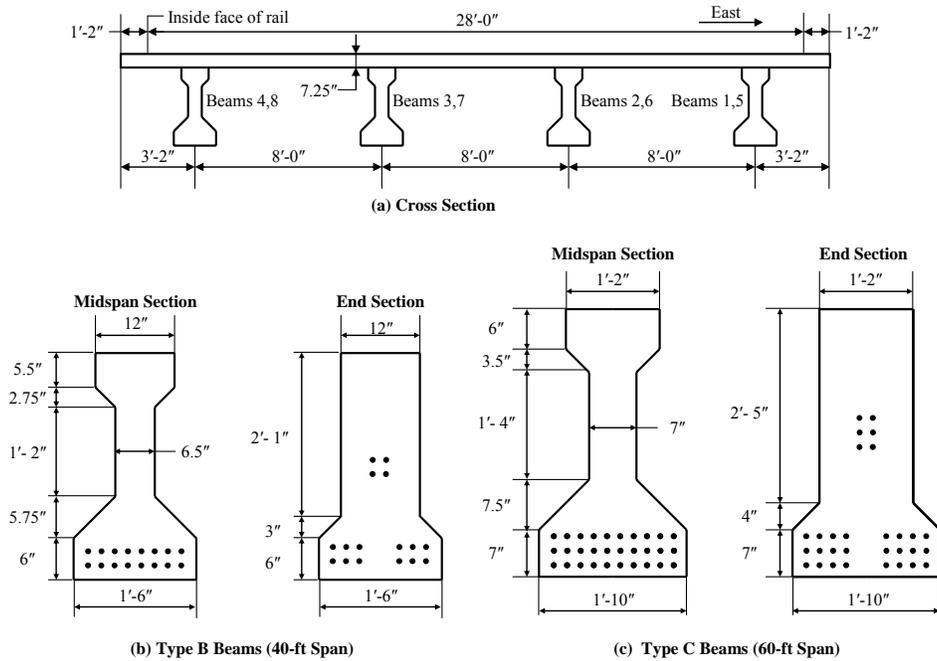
Cross Section and Beam Details for Chandler Creek Bridge
